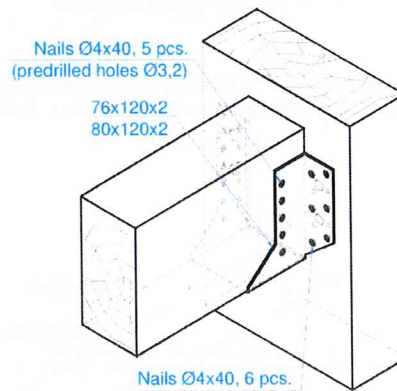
Number and position of nails in the timber beam to timber column connection with the joist hanger 76×120×2 and 80×120×2. Position of nails is symmetrical in both sides.
